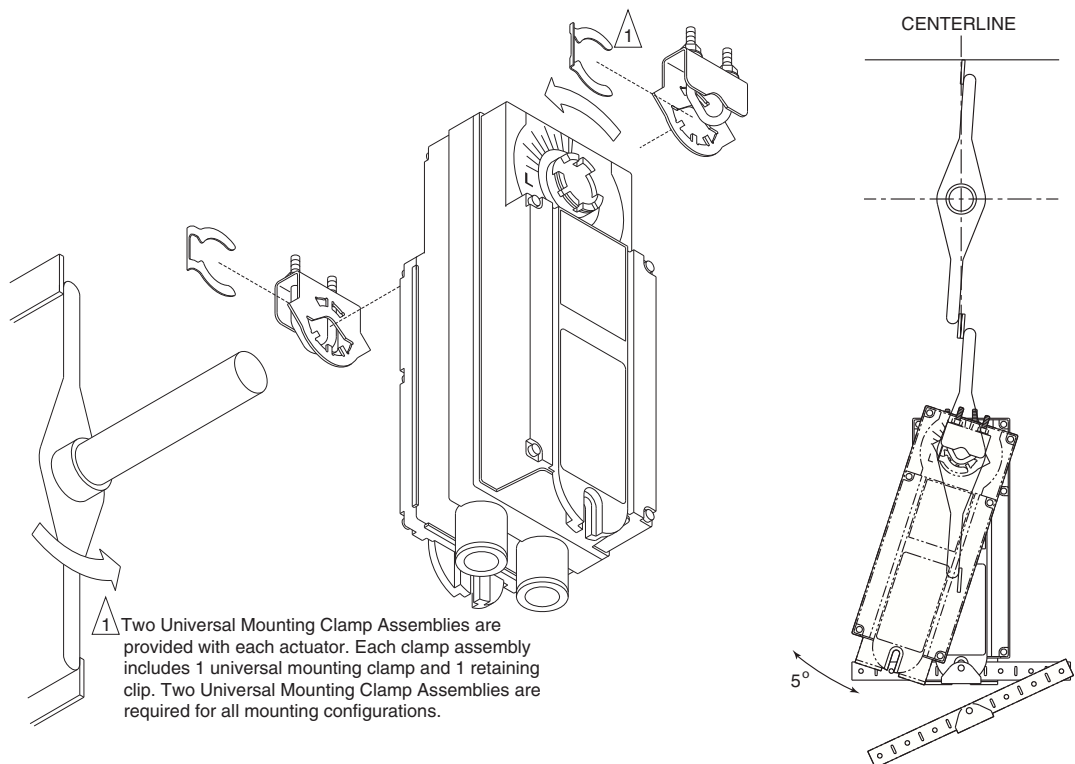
Long Damper Shaft Mounting with Counterclockwise Spring Return for Normally Closed Damper.
